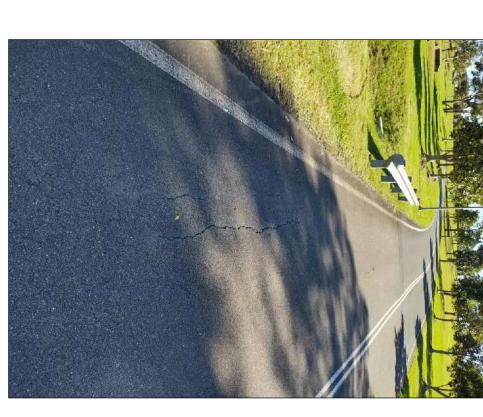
Longitudinal cracking, appears to have been previously resealed and since opened
